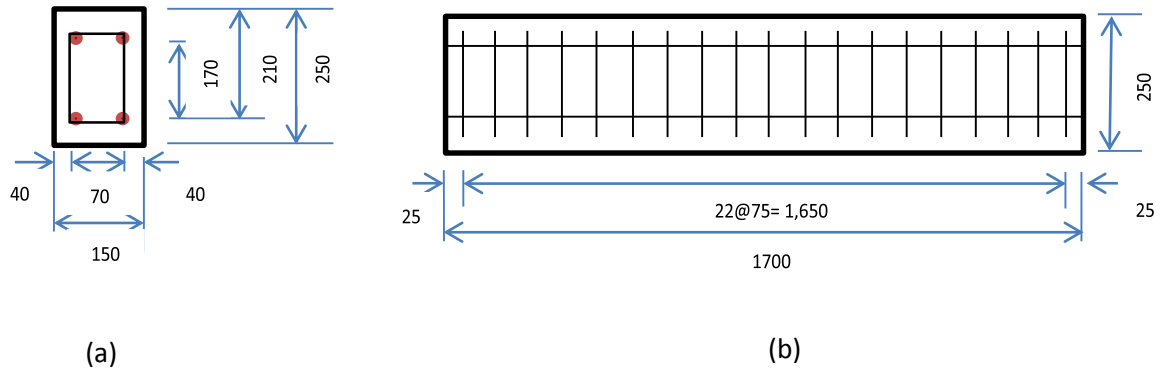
Arrangement of reinforcement bars: (a) Cross-sectional view; (b) longitudinal view, unit = mm
